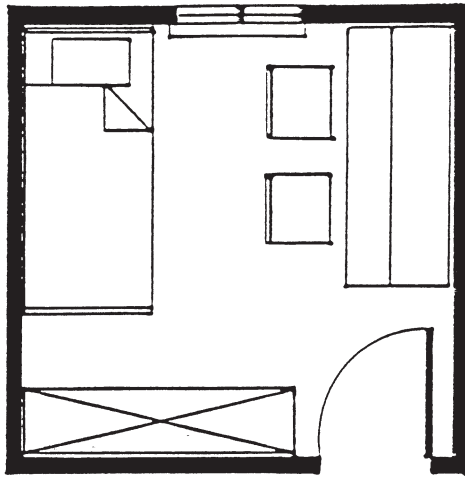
Floor Plan of the Dormitory Room (Scale: 1/50)
